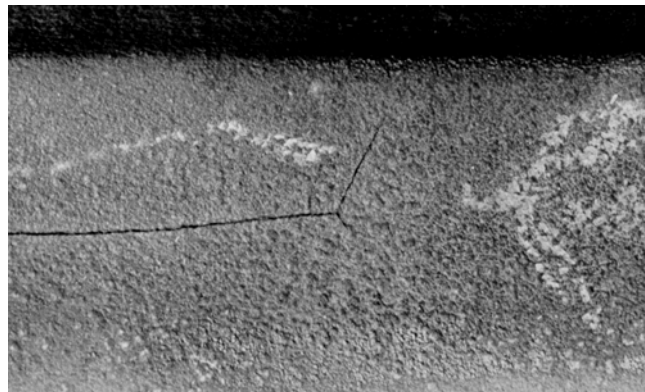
Horizontal web crack. Detailed view of the branching crack tip.
